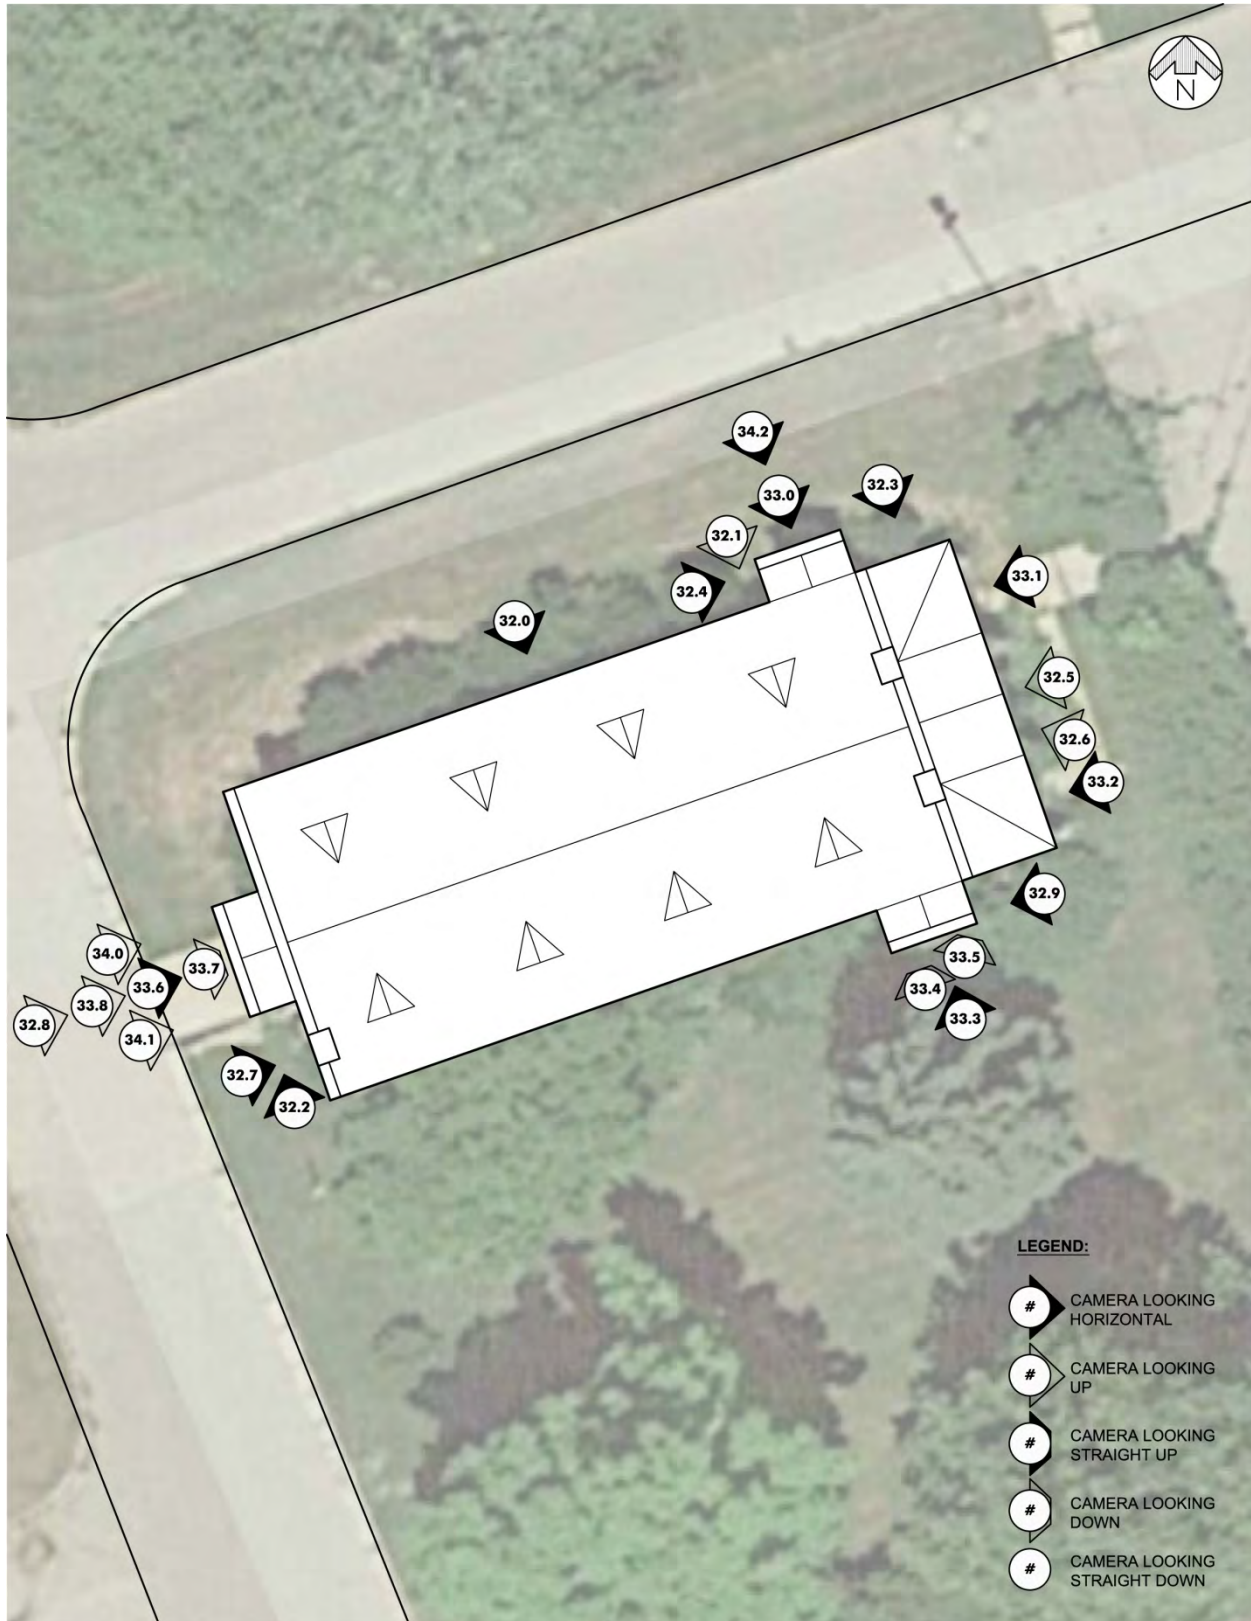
Photo No. 32.0 – 34.2 (Windows, Doors and Signage)
